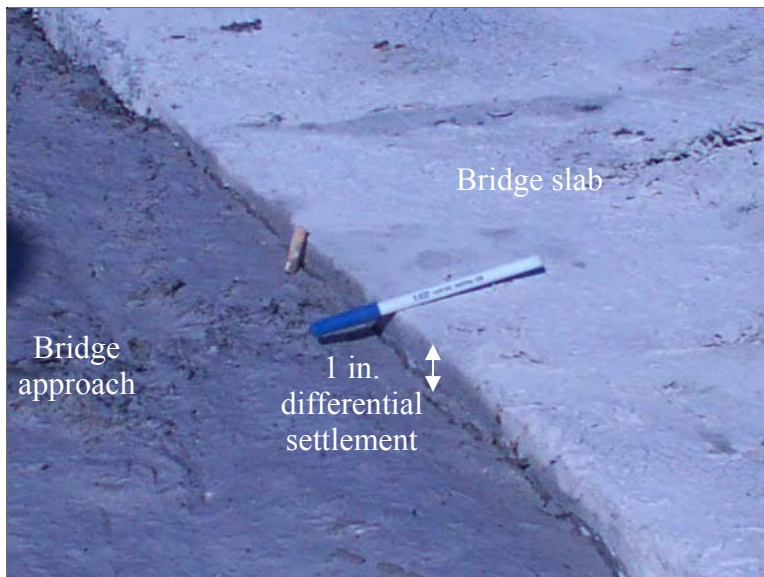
Differential settlement between the bridge slab and the bridge approach (South end of SBL)
